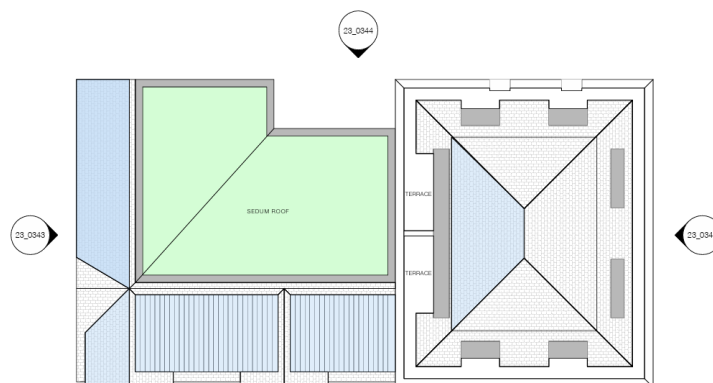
Proposed Roof Plan and PV Layout (Chandler Browne Architects)
